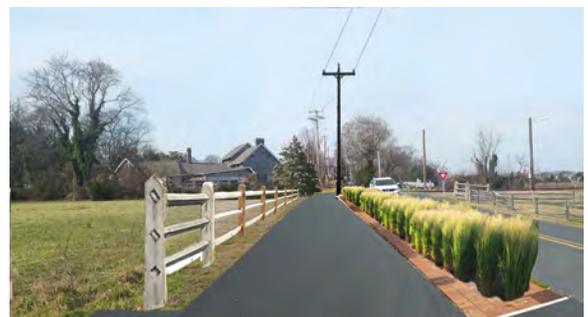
Photo simulation. A vegetated barrier would be beneficial, but if there is less than a minimum 5' distance between the shared use path and the edge of the travel lane, a physical barrier is recommended.
